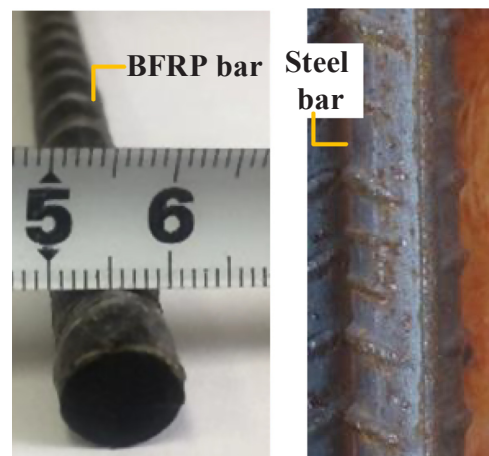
BFRP bar and steel bar used in the concrete beams.
